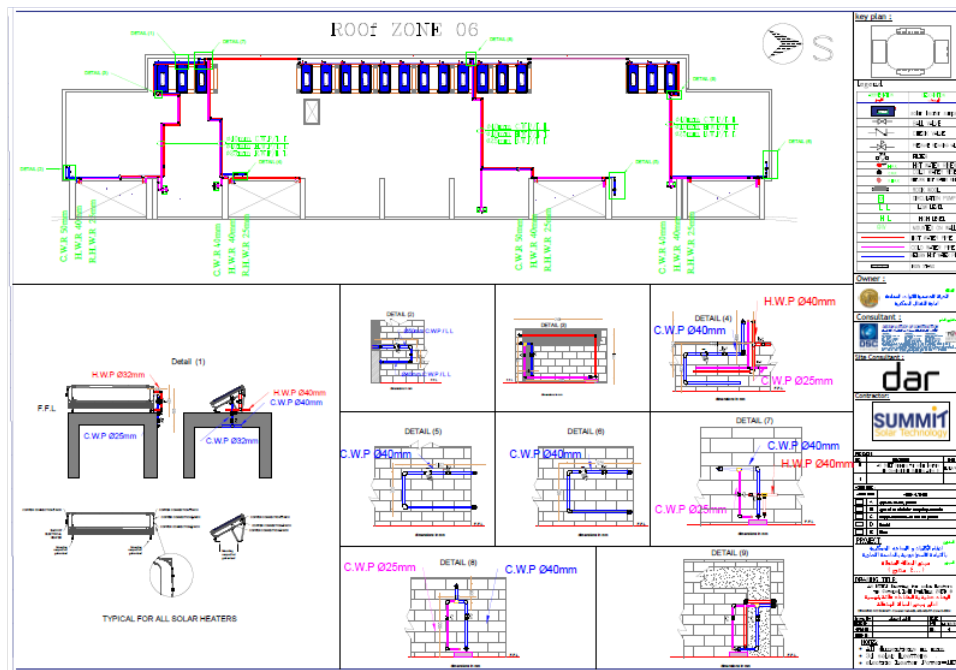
Hydraulic Scheme of Roof Zone 6 Source: Summit
